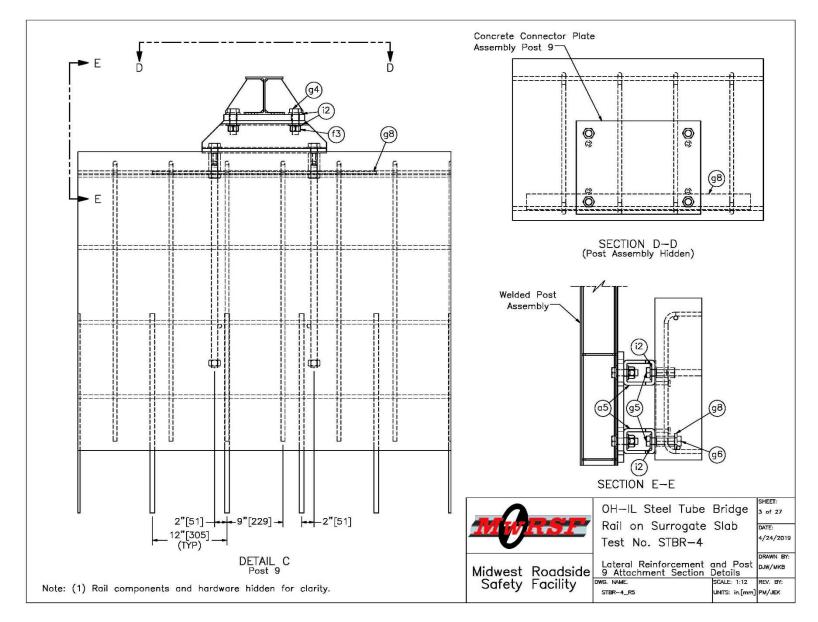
Post-to-Deck Connection Details, Test No. STBR-4
